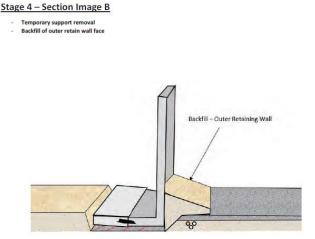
Installation of Precast Earthen Ramp & retaining Walls
